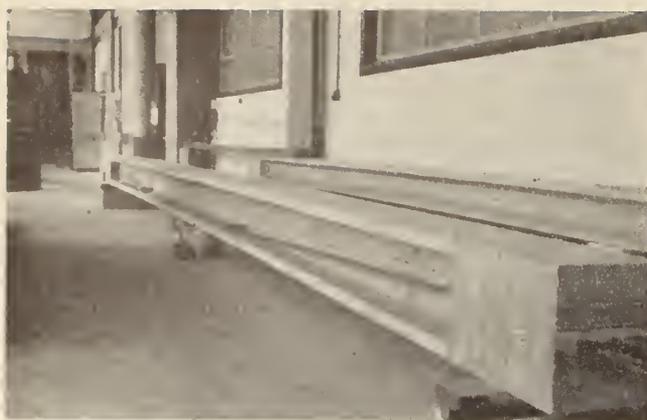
Prestressed concrete beam cast in the University of Ghent laboratory.
